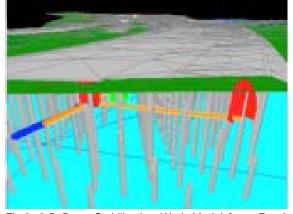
3-D Deep Stabilization Work Model for a Road Construction Project in Finland (CityCAD, Sito Oy).
